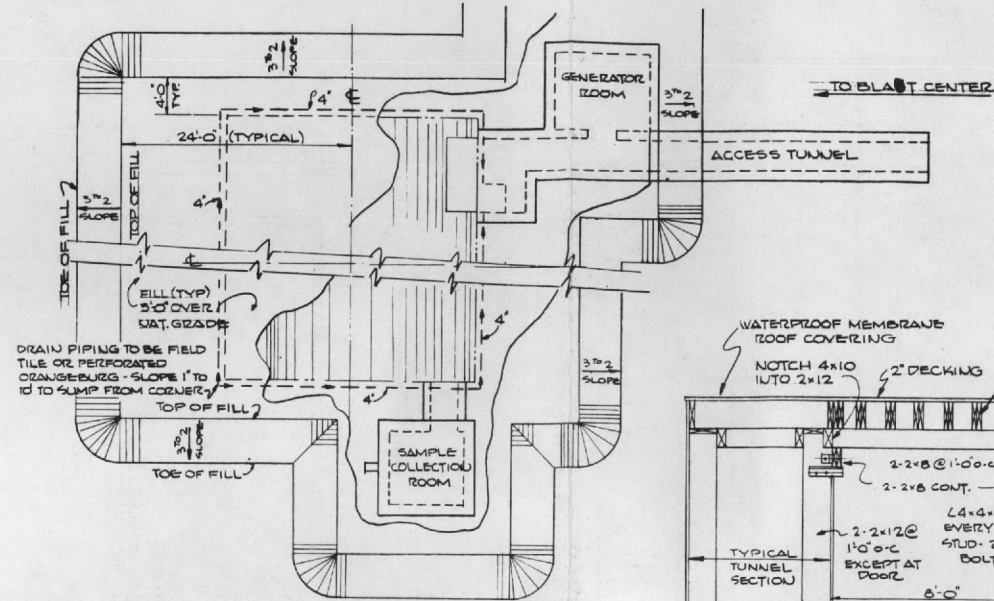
Underground Personnel Shelter - Foundation and Floor Slab.
